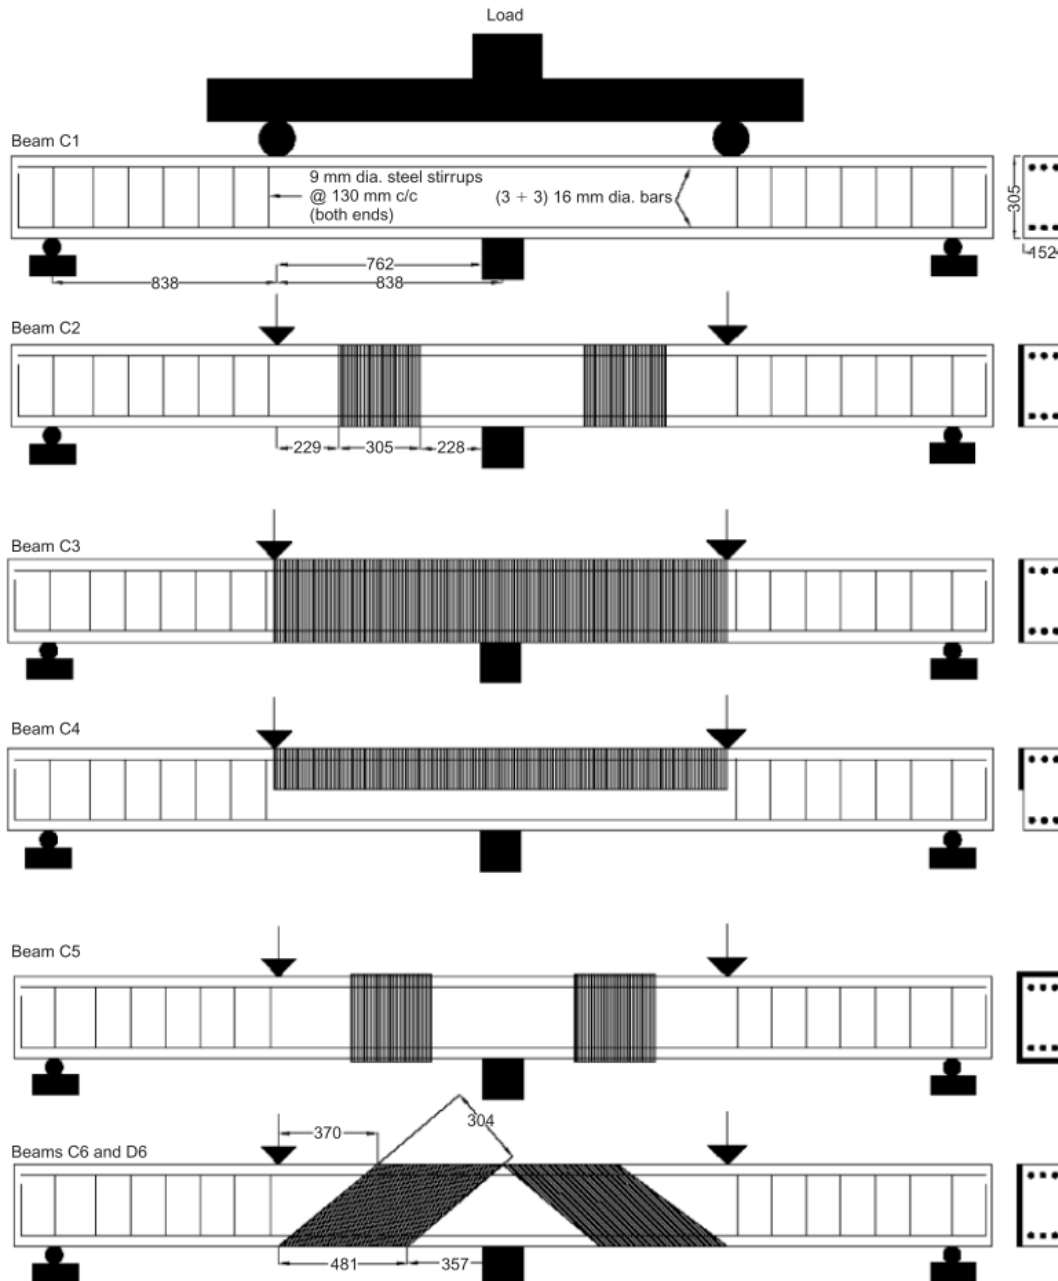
Detail of the beams tested by Bukhari et al. [22]
